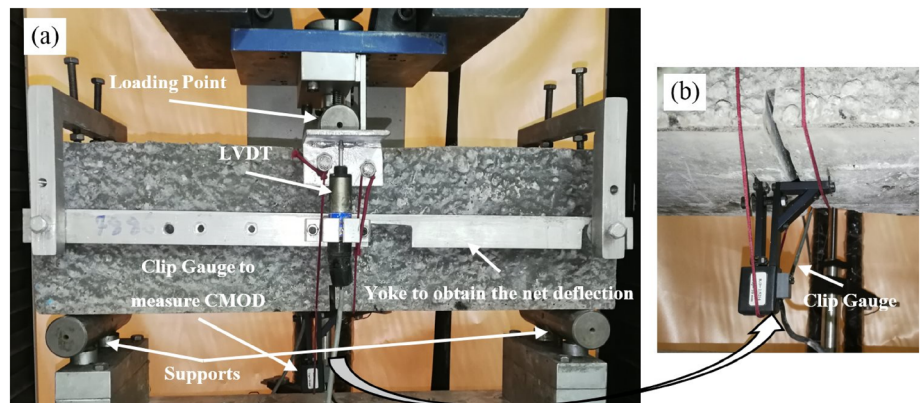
(a) Bending test setup and details, (b) clip gauge
